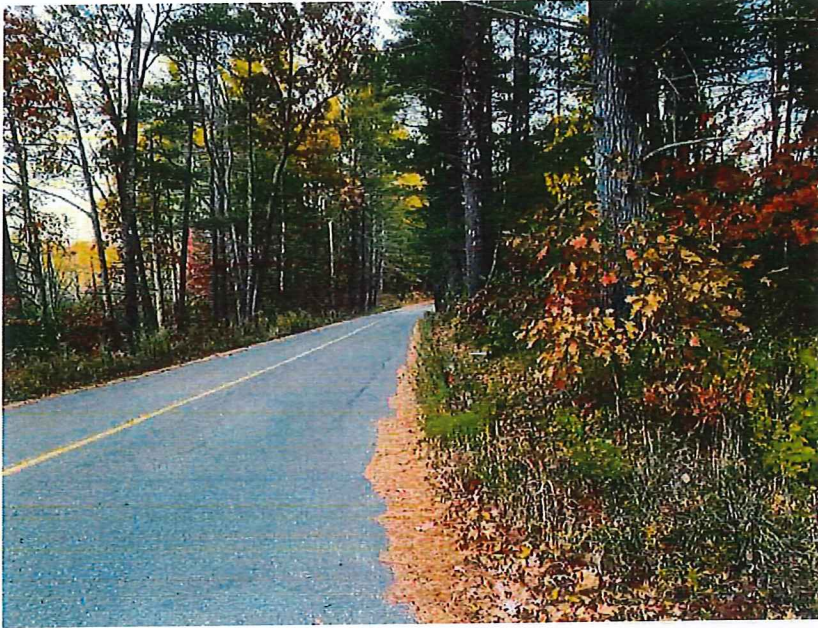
Sight Distance – Hoyts Wharf Road – Facing Southeast
